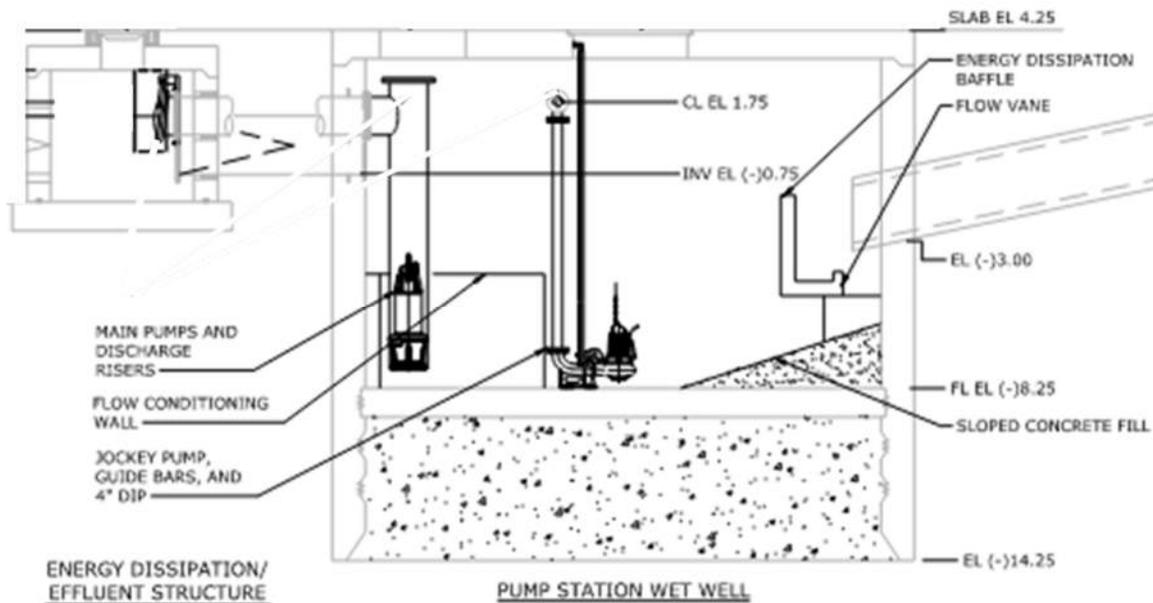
Proposed Improvements to Existing Elsa Road Pump Station Wet Well
